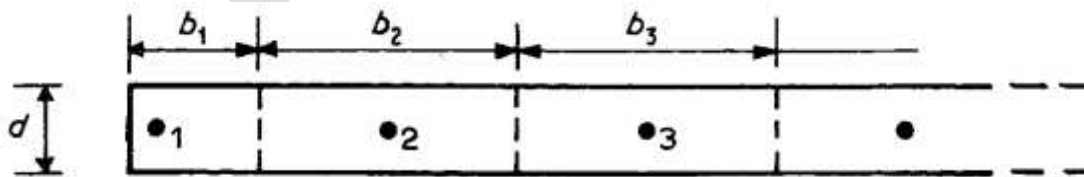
Subdivision of deck cross –section for longitudinal grillage members
